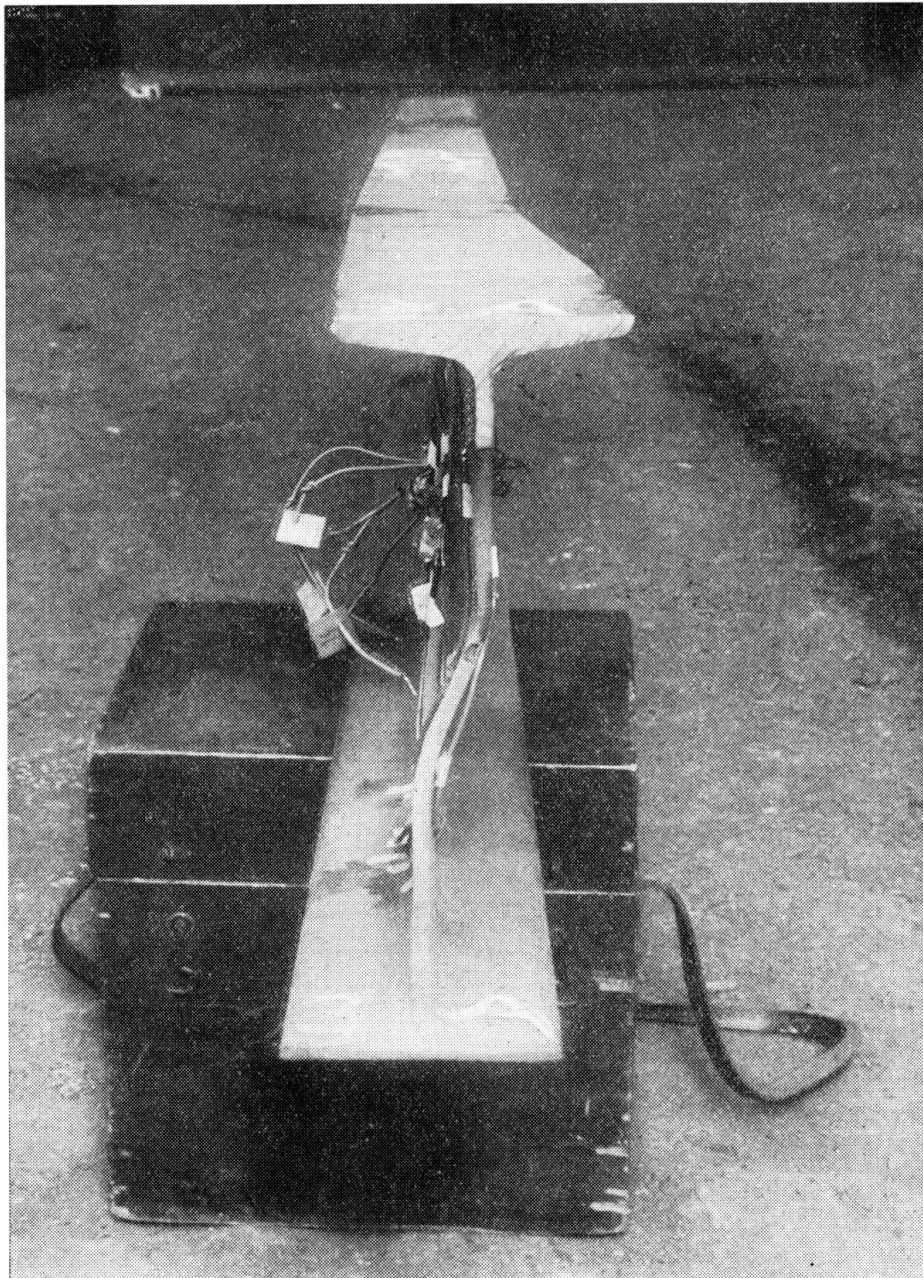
Web buckling test confirming assumed type of failure under overload
